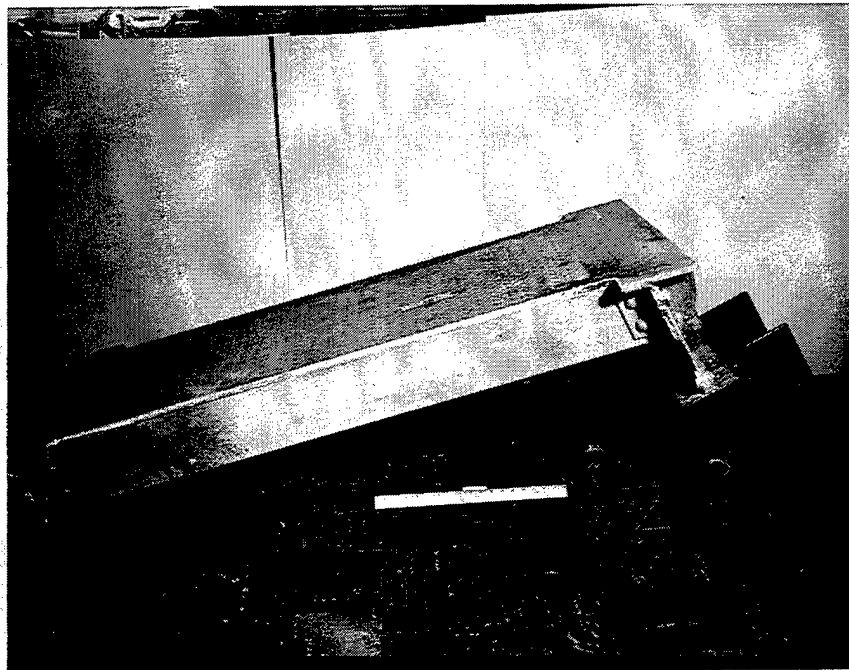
Side view of the large test section cut from the ramp deck end of the AVLB male end panel assembly. The special test jig was already bolted to the bottom of the end plate at right.
